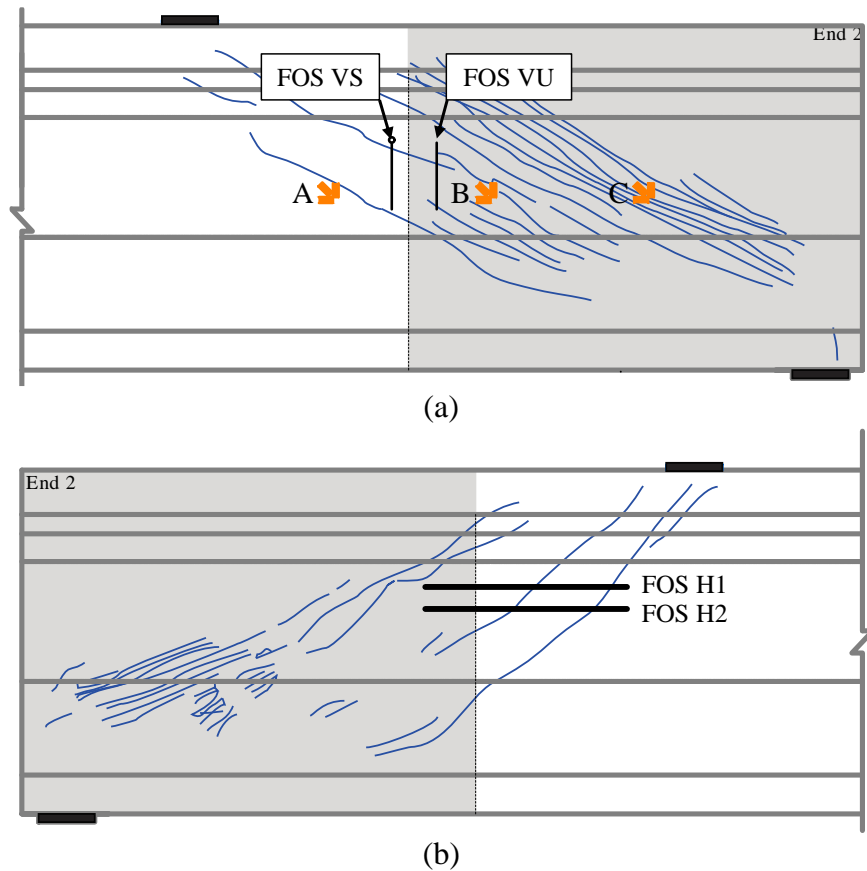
Crack patterns at final load on (a) back face and (b) front face
